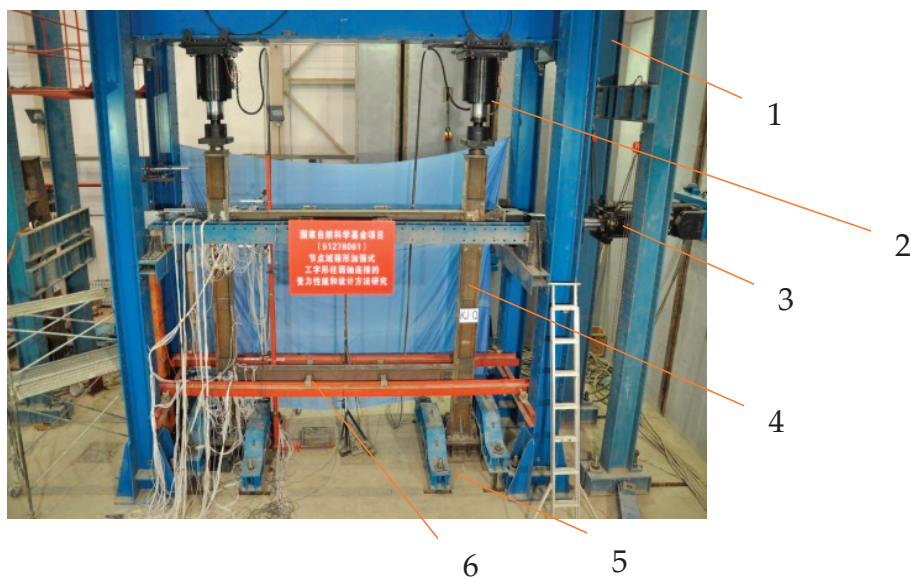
Test setup. 1. Loading portal steel frame; 2. Electro-hydraulic servo jack; 3. MTS actuator; 4. Steel frame specimen; 5. Compression beam; 6. Lateral support. Note on the red signboard: Nature Science Foundation of China (51278061), research on the mechanical performance and design methods of the weak axis connection of the box-strengthened panel zone of the I-section column.
